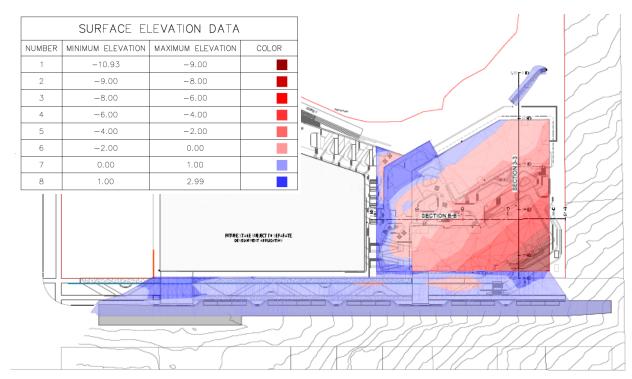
PROPOSED CUT AND FILL PLAN:
